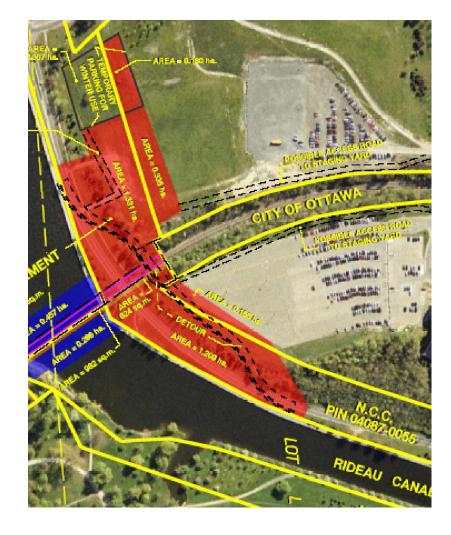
Potential Construction Staging Areas and Accesses
